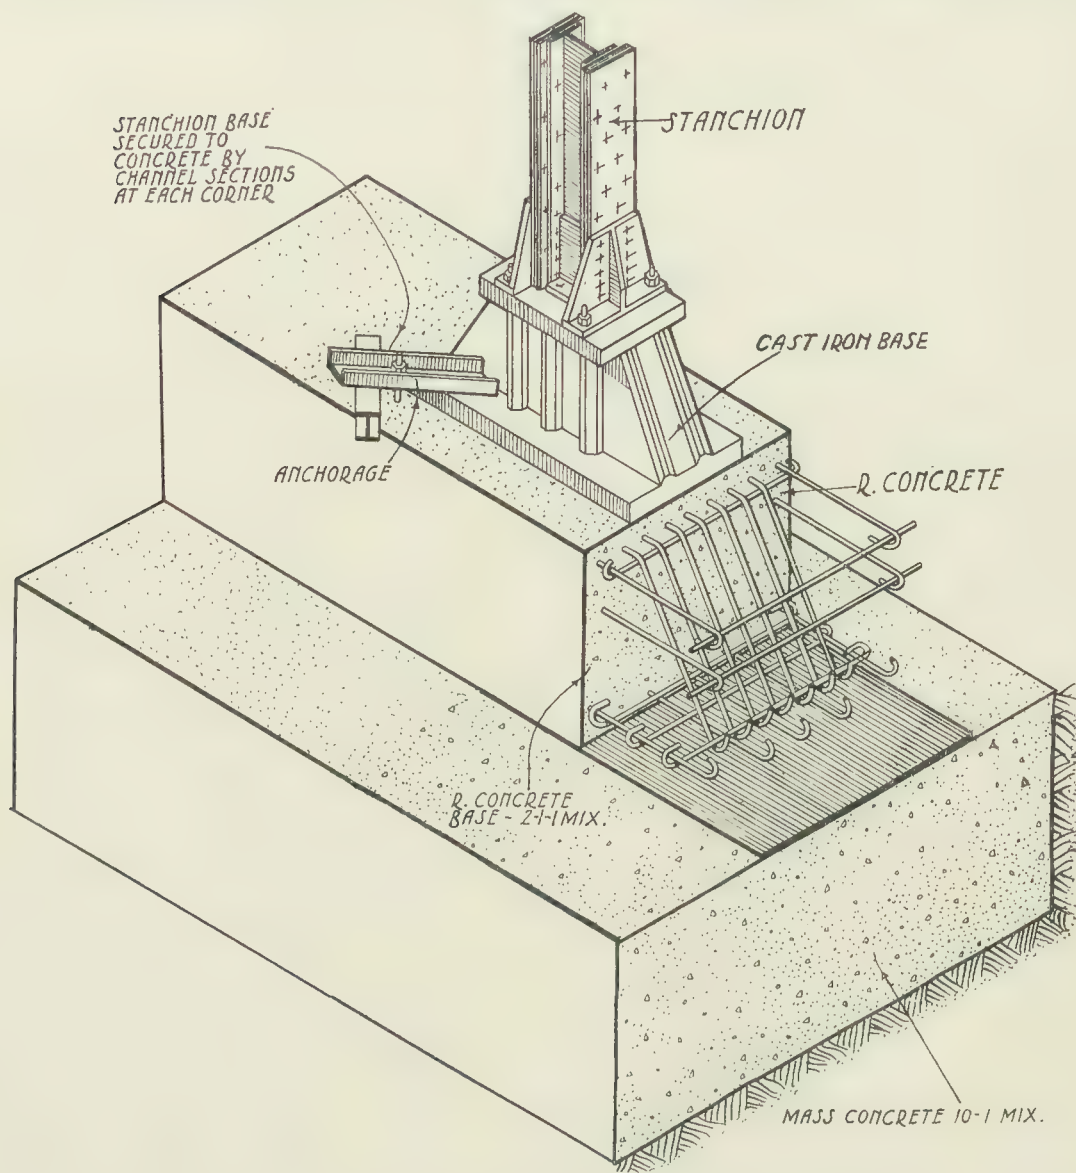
CAST IRON AND REINFORCED CONCRETE STANCHION BASES
